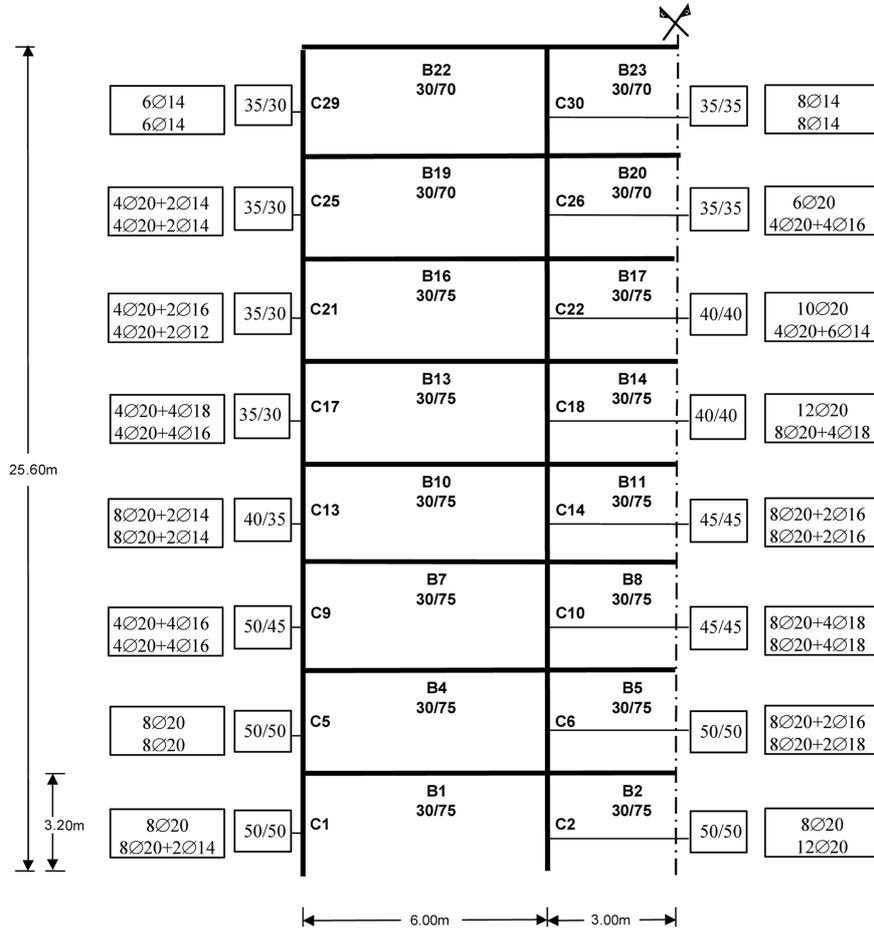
Structural system and column reinforcement of 8-storey frame designed to EC 2 & 8
